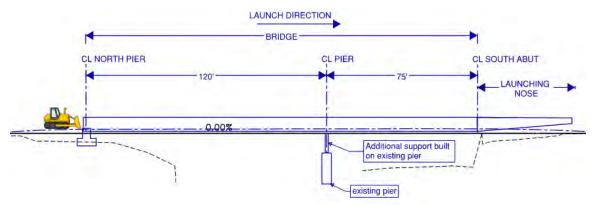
Schematic of push-launch requirements at Suburbia bridge project site
